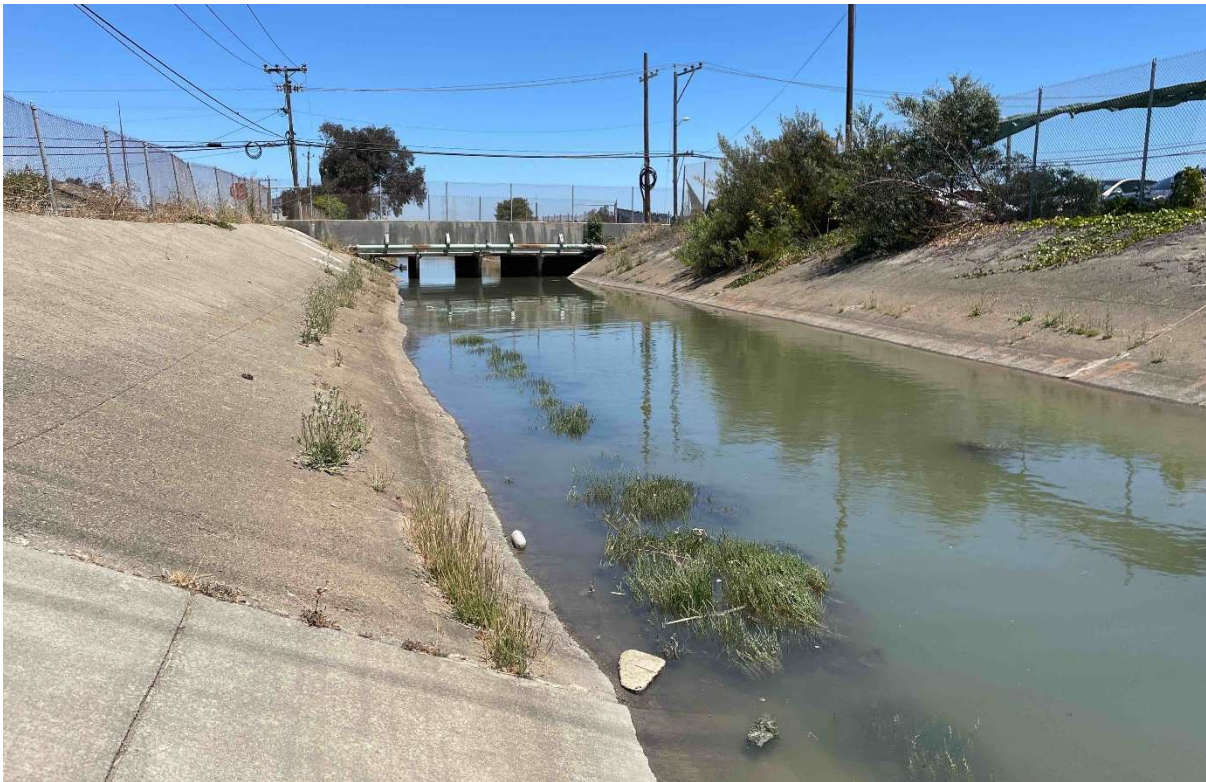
View of culverts placed in concrete lined Highline Canal. Photo facing east.
